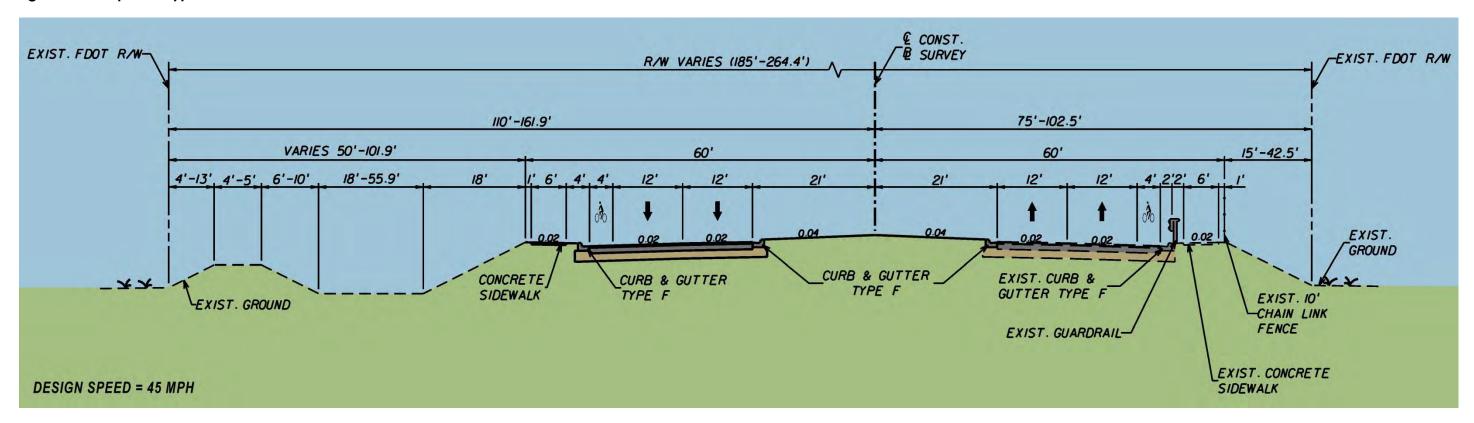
Existing Typical Section - Madrid Street to 40th Street
